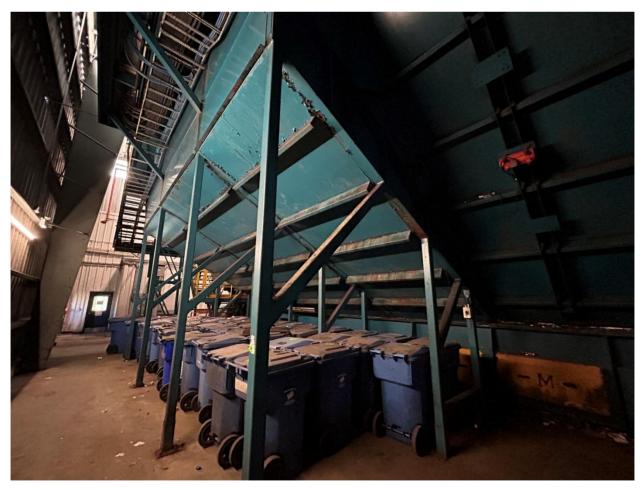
Cat walk (north end of MRF building) to sort room
